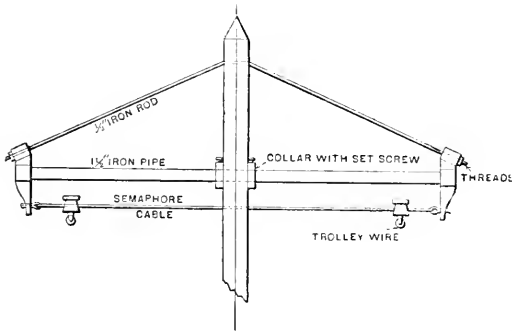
DOUBLE BRACKET CONSTRUCTION.
